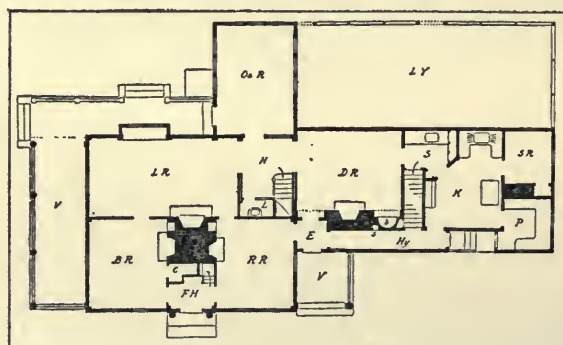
Remodeled plan—first floor. Oa R, Open-air Room; E, Entry; V, Veranda; L, Lavatory; S, Stairs; S R., Servant's Room; b, Buffet; s, Stand-pipe; L Y., Laundry yard; R R., Reception room
